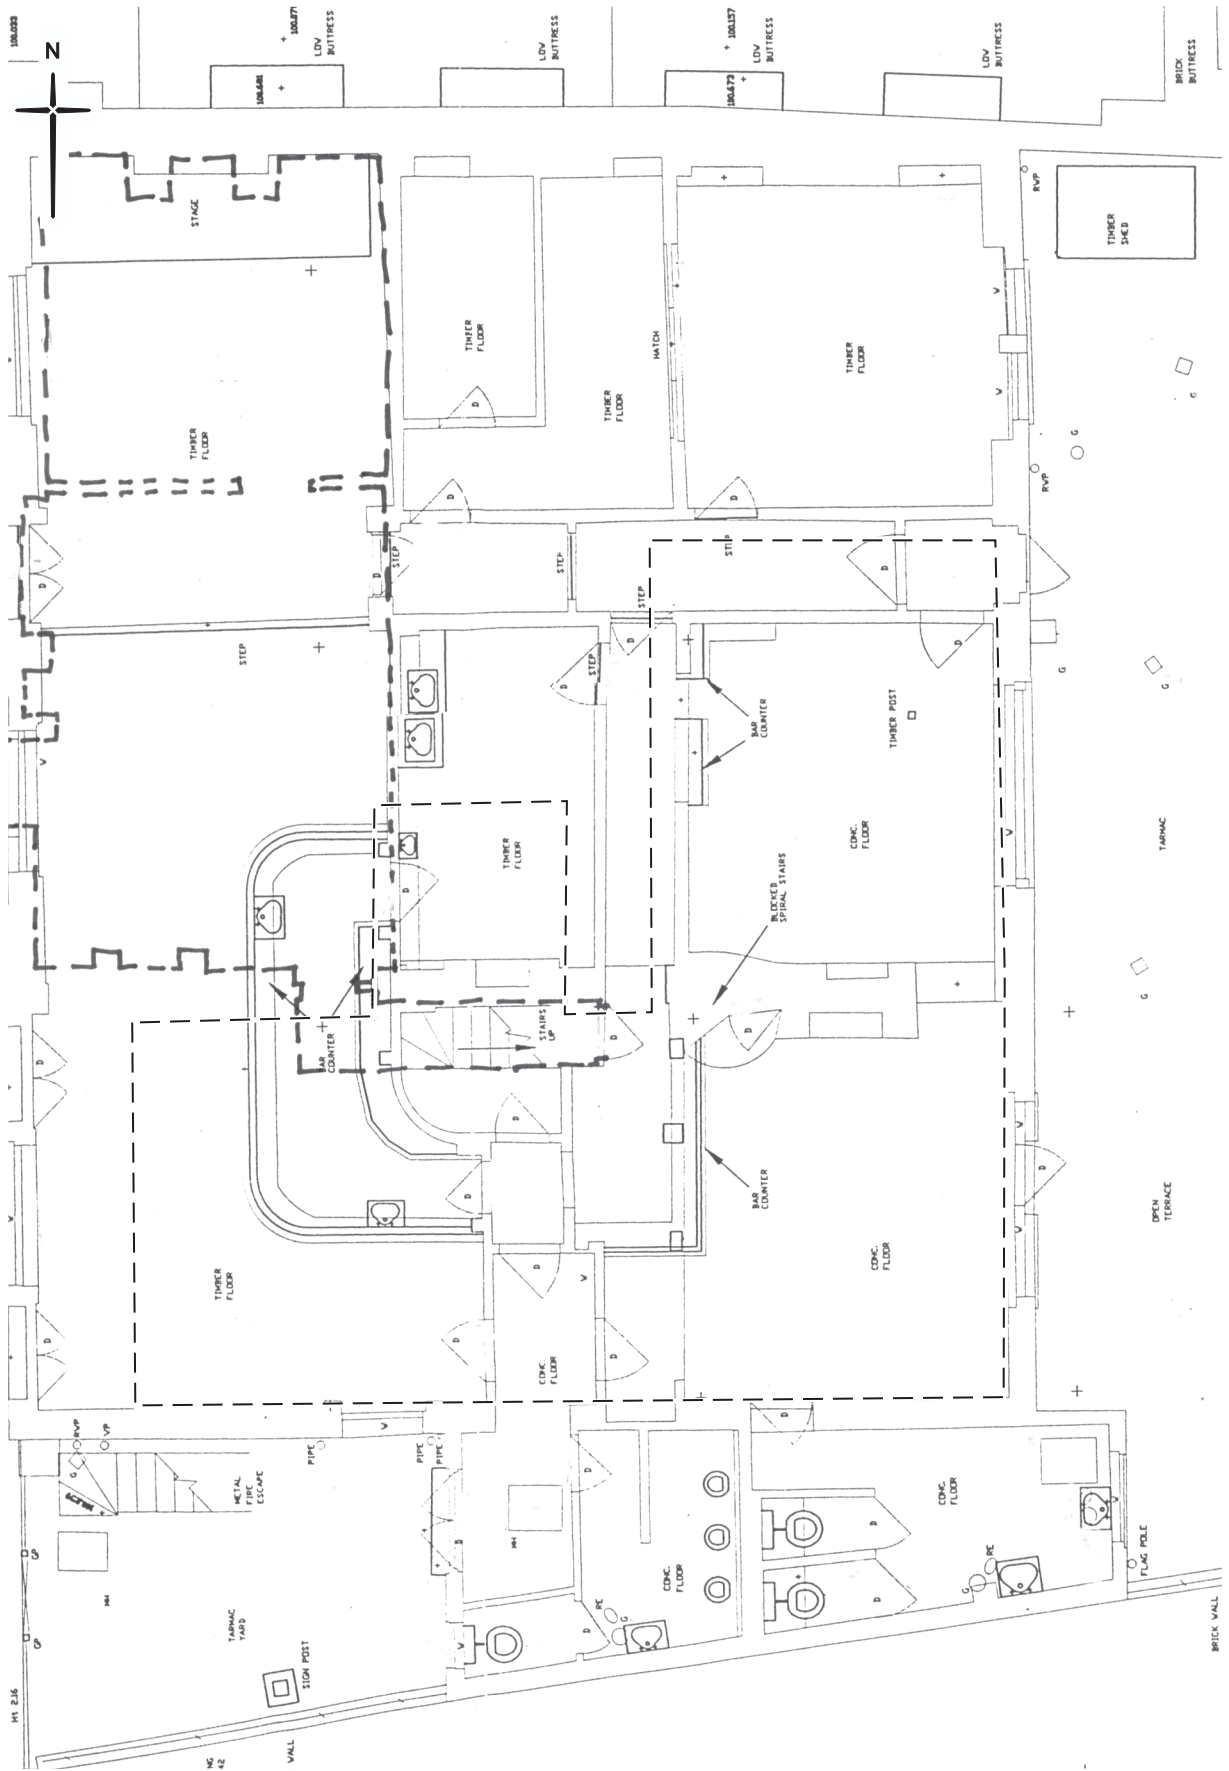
Plan of the ground floor of The Gun with a plan of the cellars superimposed in dashed outline
